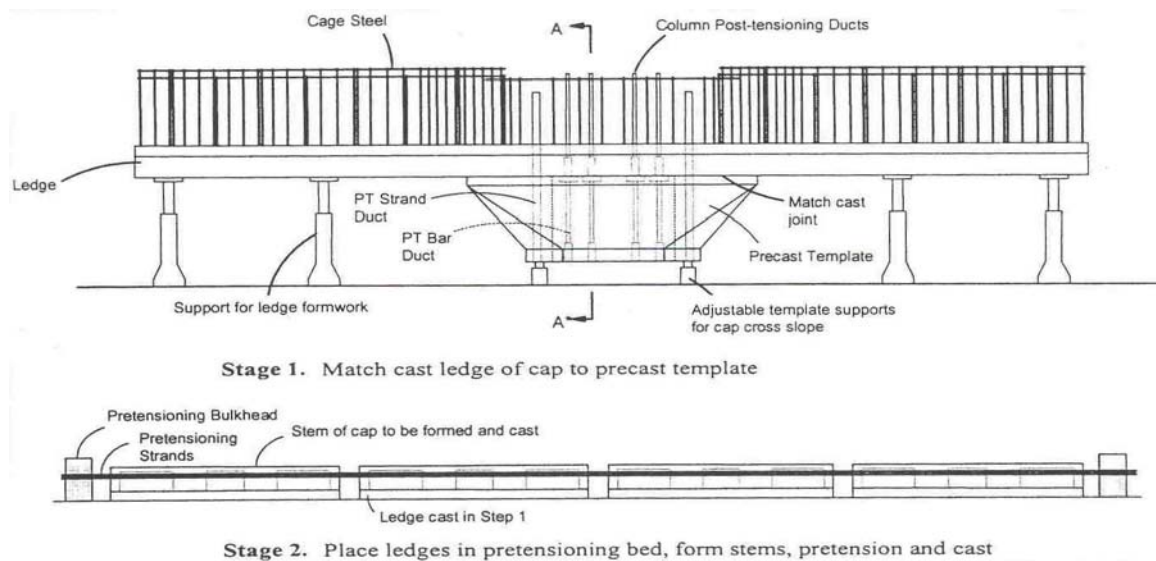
Method for creating match-cast joint between column and pier cap (Billington et al. 1999)
